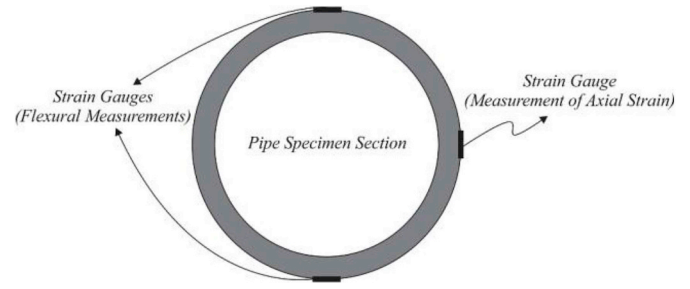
Arrangement of Strain Gauges at each Instrumented Pipe Section.
